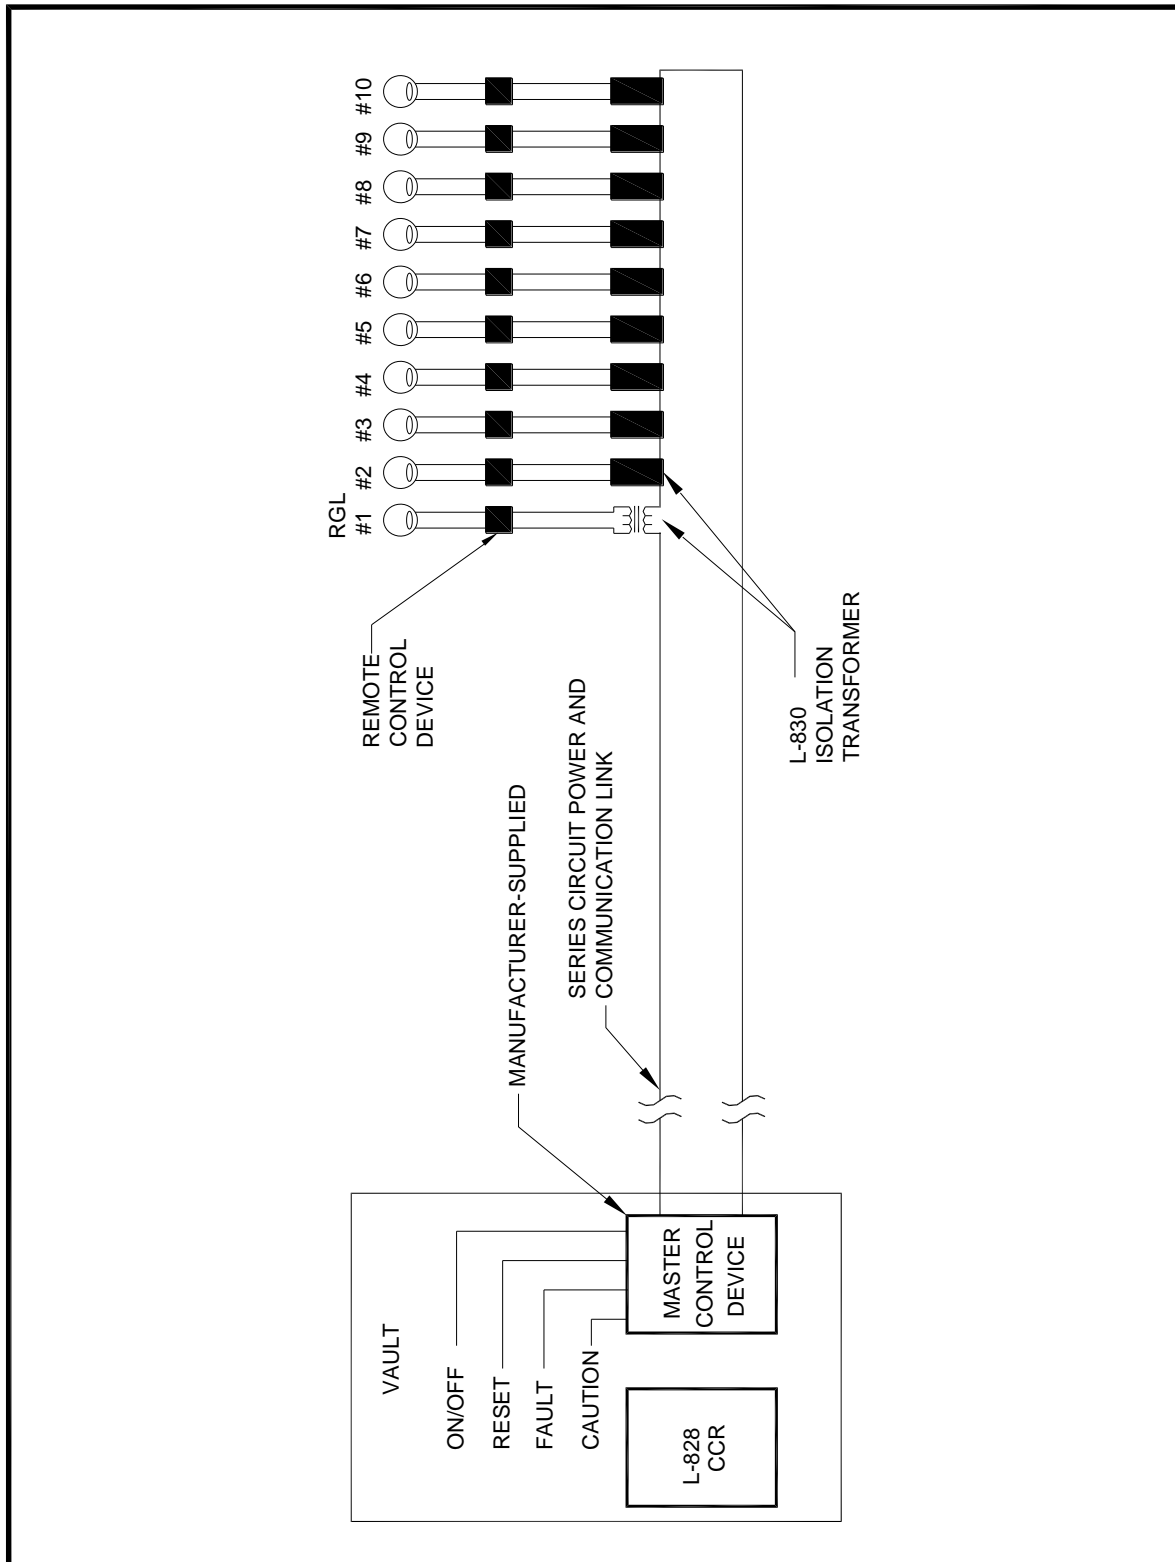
Typical In-Pavement RGL External Wiring Diagram – Power Line Carrier Communication, Multiple Lights per Remote
